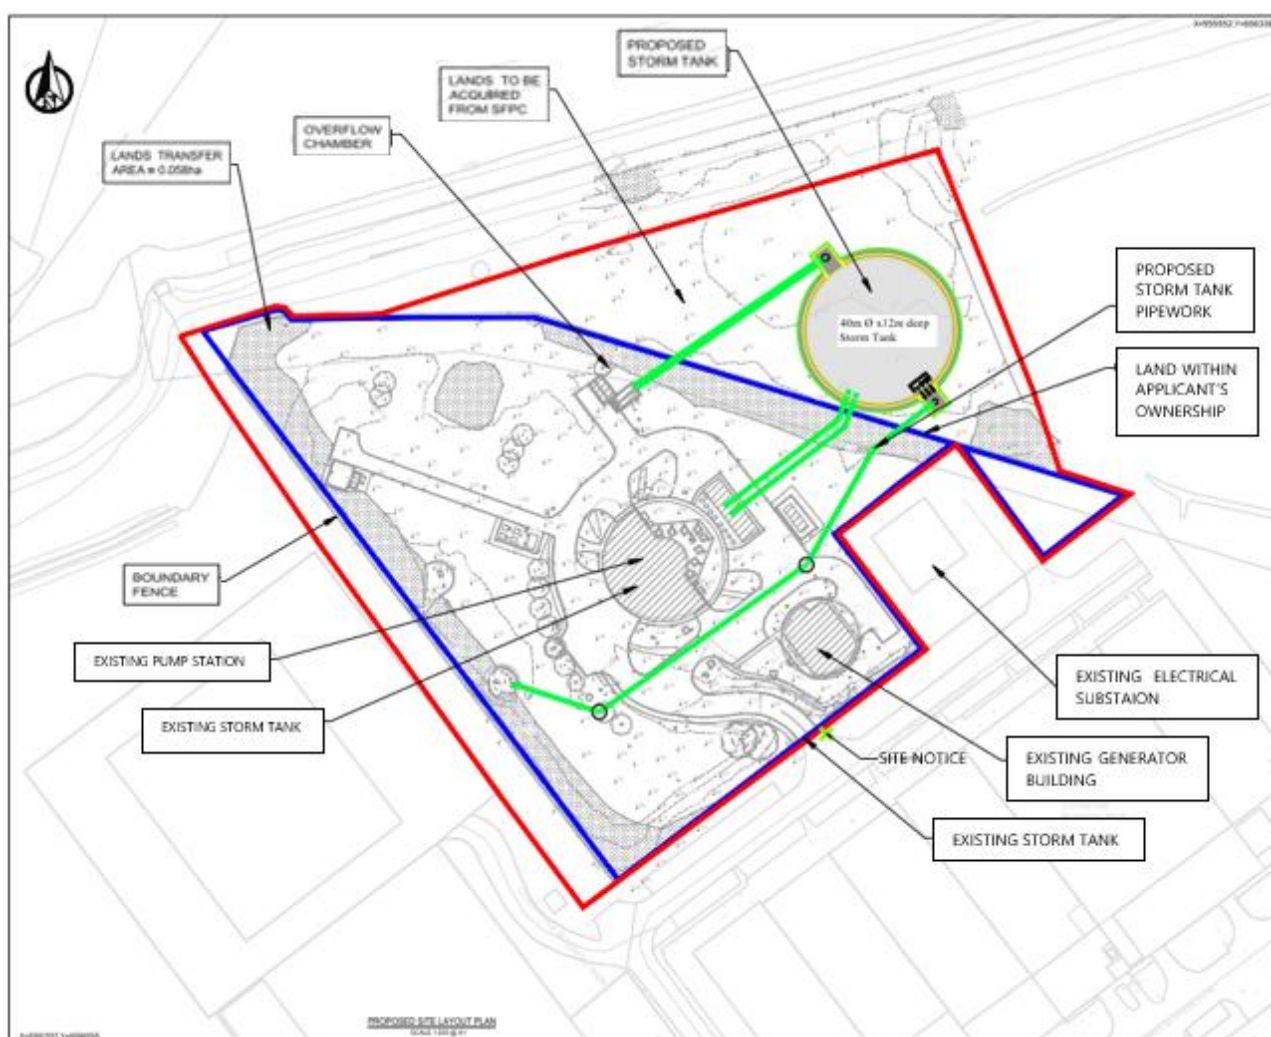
CORCANREE PS PROPOSED SITE LAYOUT
